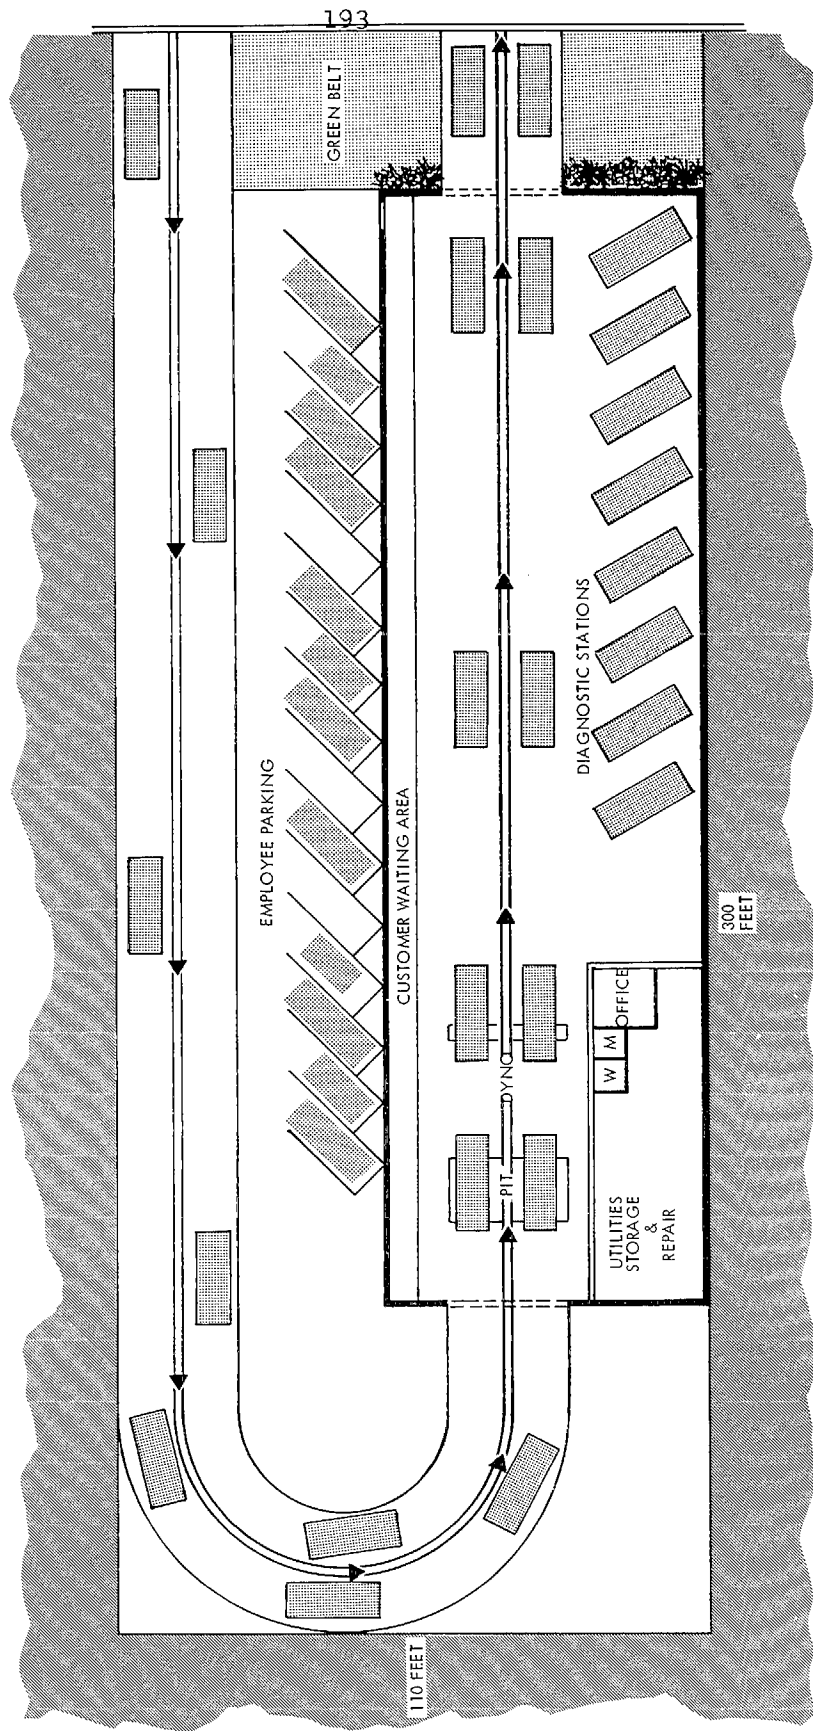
TWO-LANE STATION FLOOR PLANS (Sheet 1 of 3)
